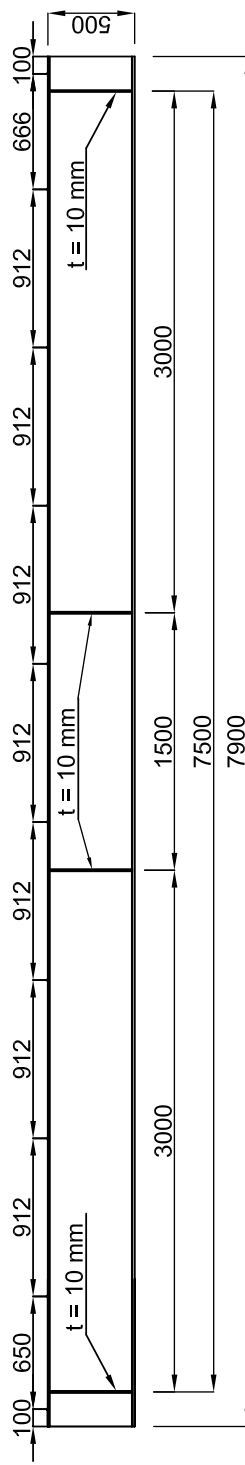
Elevation of steel girder with distance between the hard shims on the top flange. Deck type: DuraSpan
